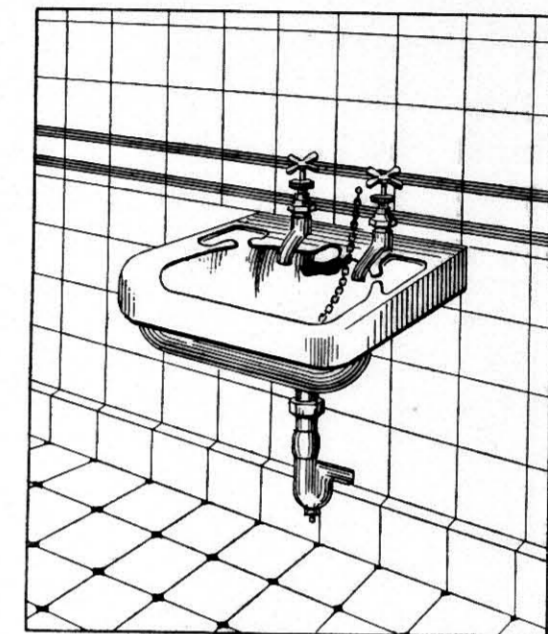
Bad Arrangement of Waste from Lavatory Basin—small plug Outlet and large Trap.
